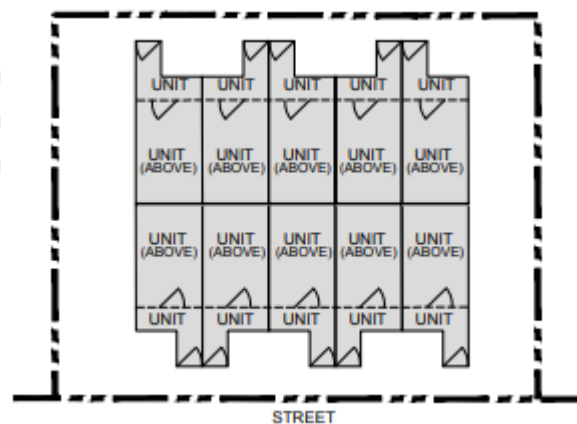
Stacked Back-to-back Townhouse Dwelling
